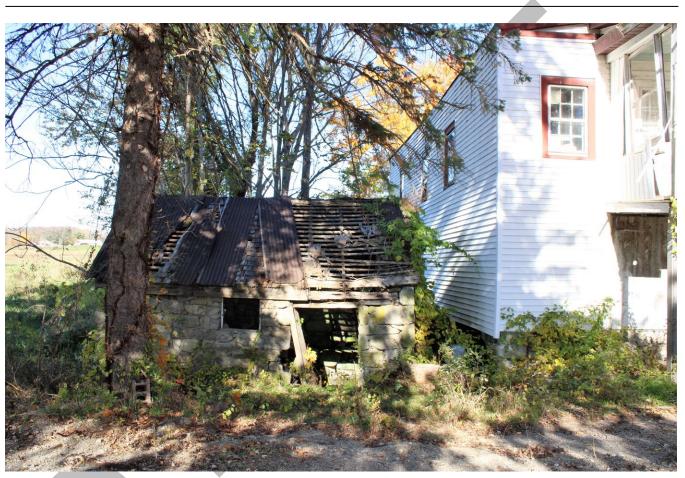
View of the south elevation of the spring house, camera facing northeast.
